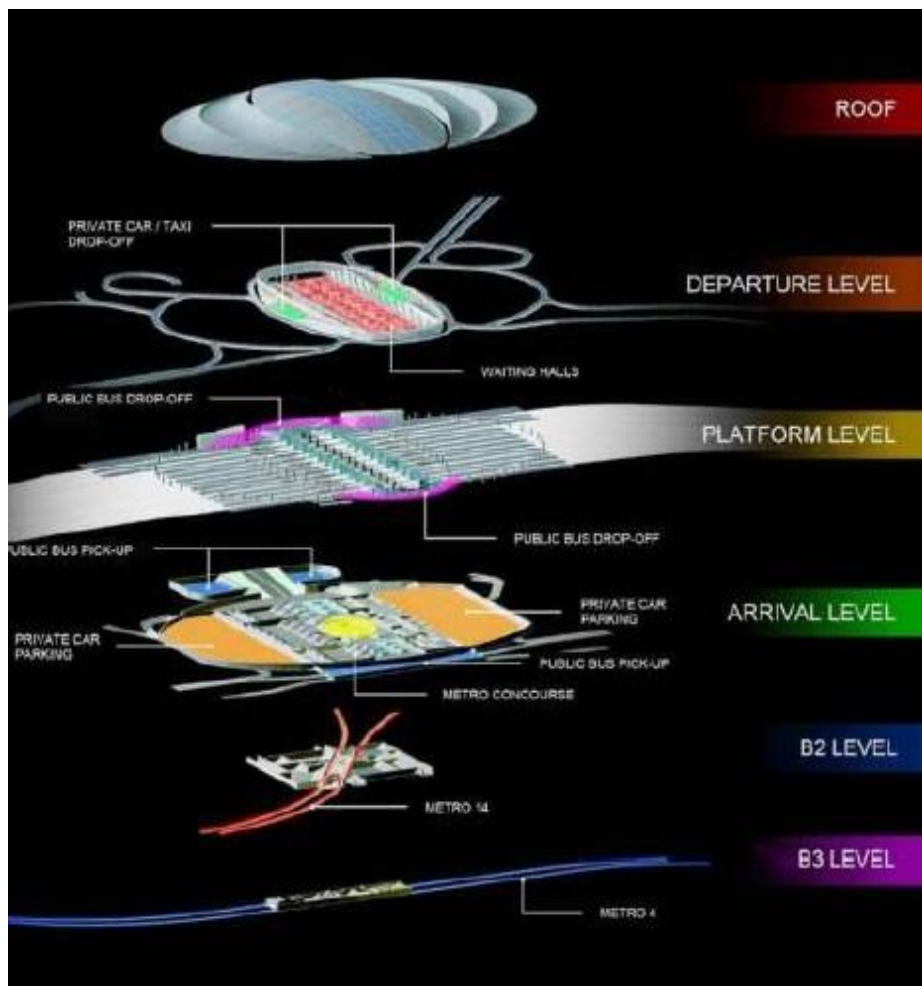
Beijing South Railway Station Section (Source: Krummeck, 2009)
